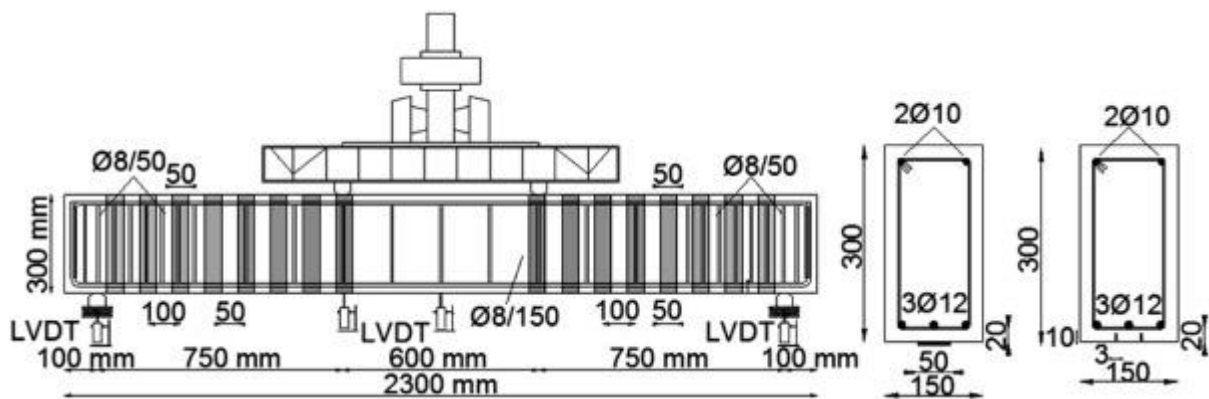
Geometry, loading conditions and reinforcement details of the tested beams (ref.83).
